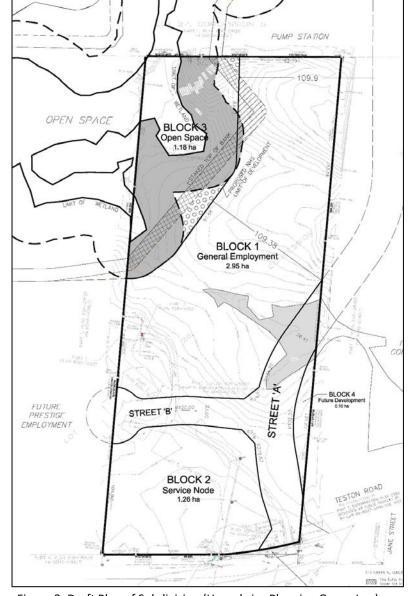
Draft Plan of Subdivision (Humphries Planning Group Inc.)
